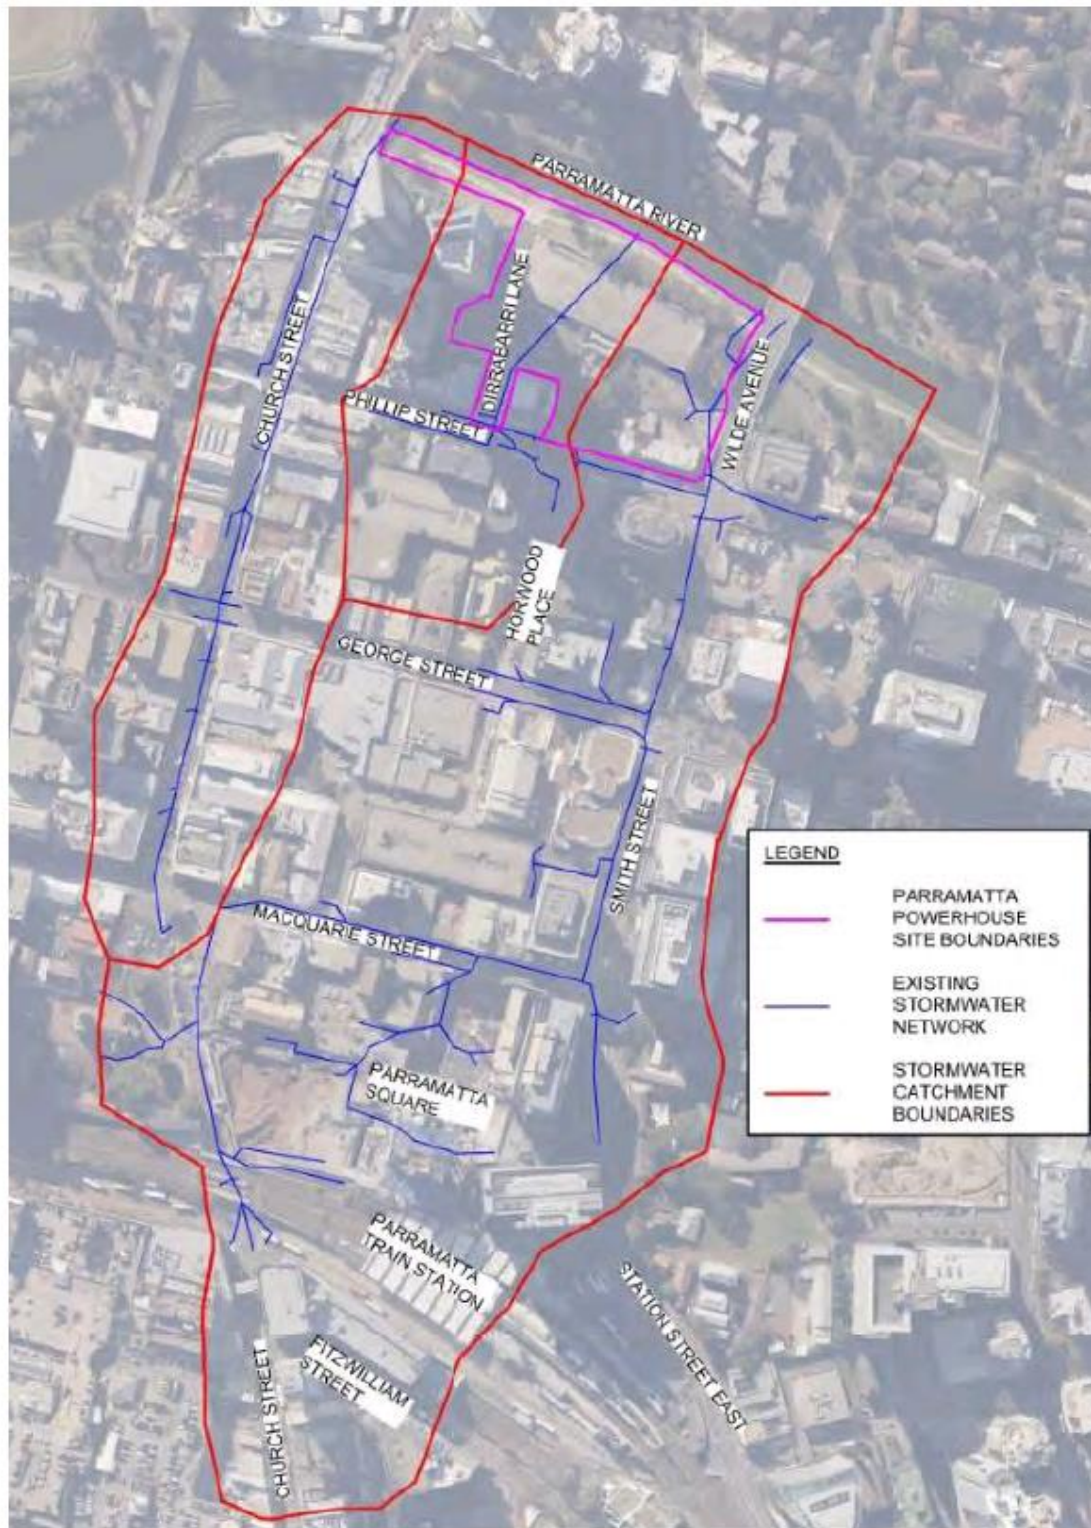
Existing stormwater drainage infrastructure catchment plan for areas in close proximity to the Powerhouse Parramatta development site
